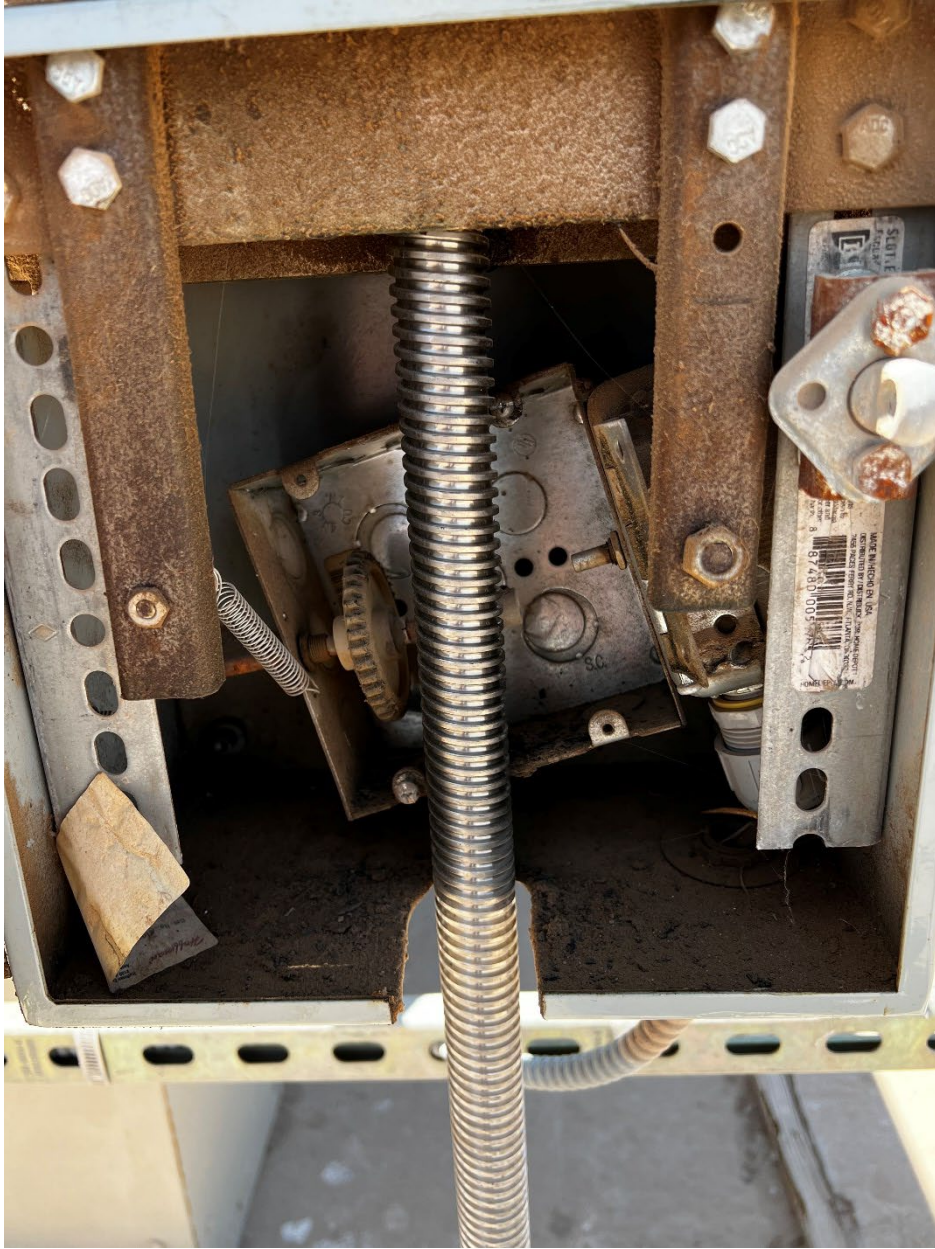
Worm gear assembly for the Waco Diversion structure. The assembly does not function because the worm gear is detached from the lead screw of the gate stem.
